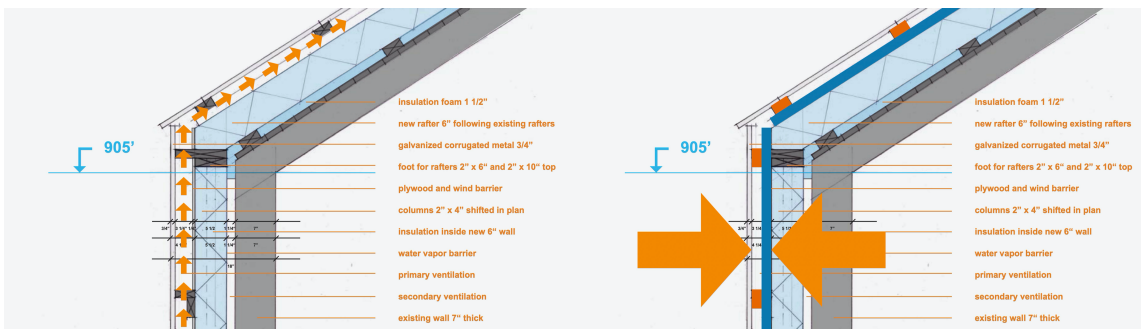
Detail façade and roof and crisscrossing sleepers
